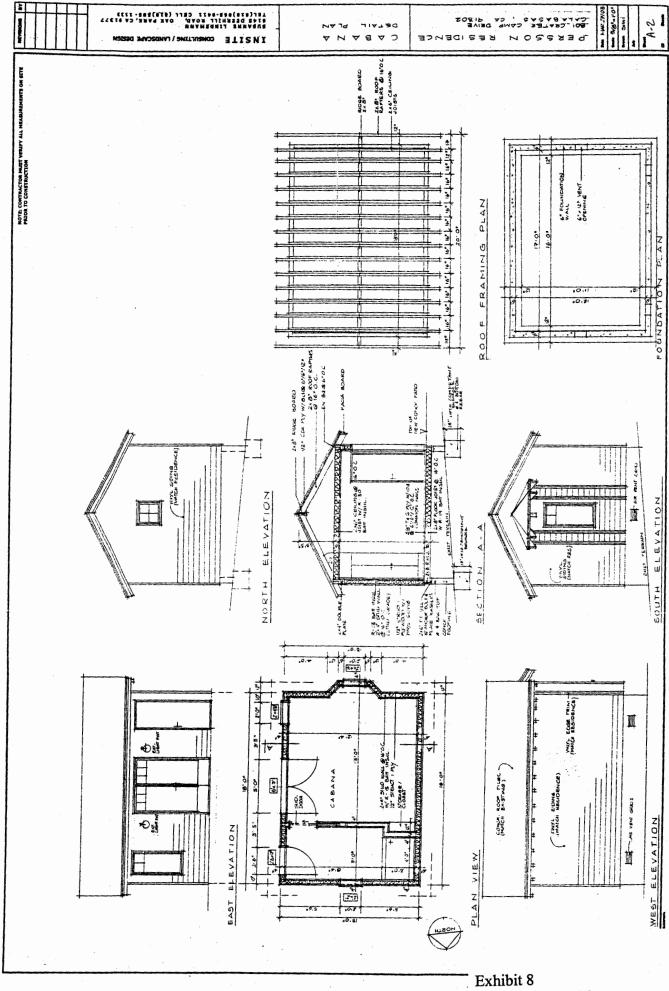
CDP 4-99-016-A2 Cabana Plan
